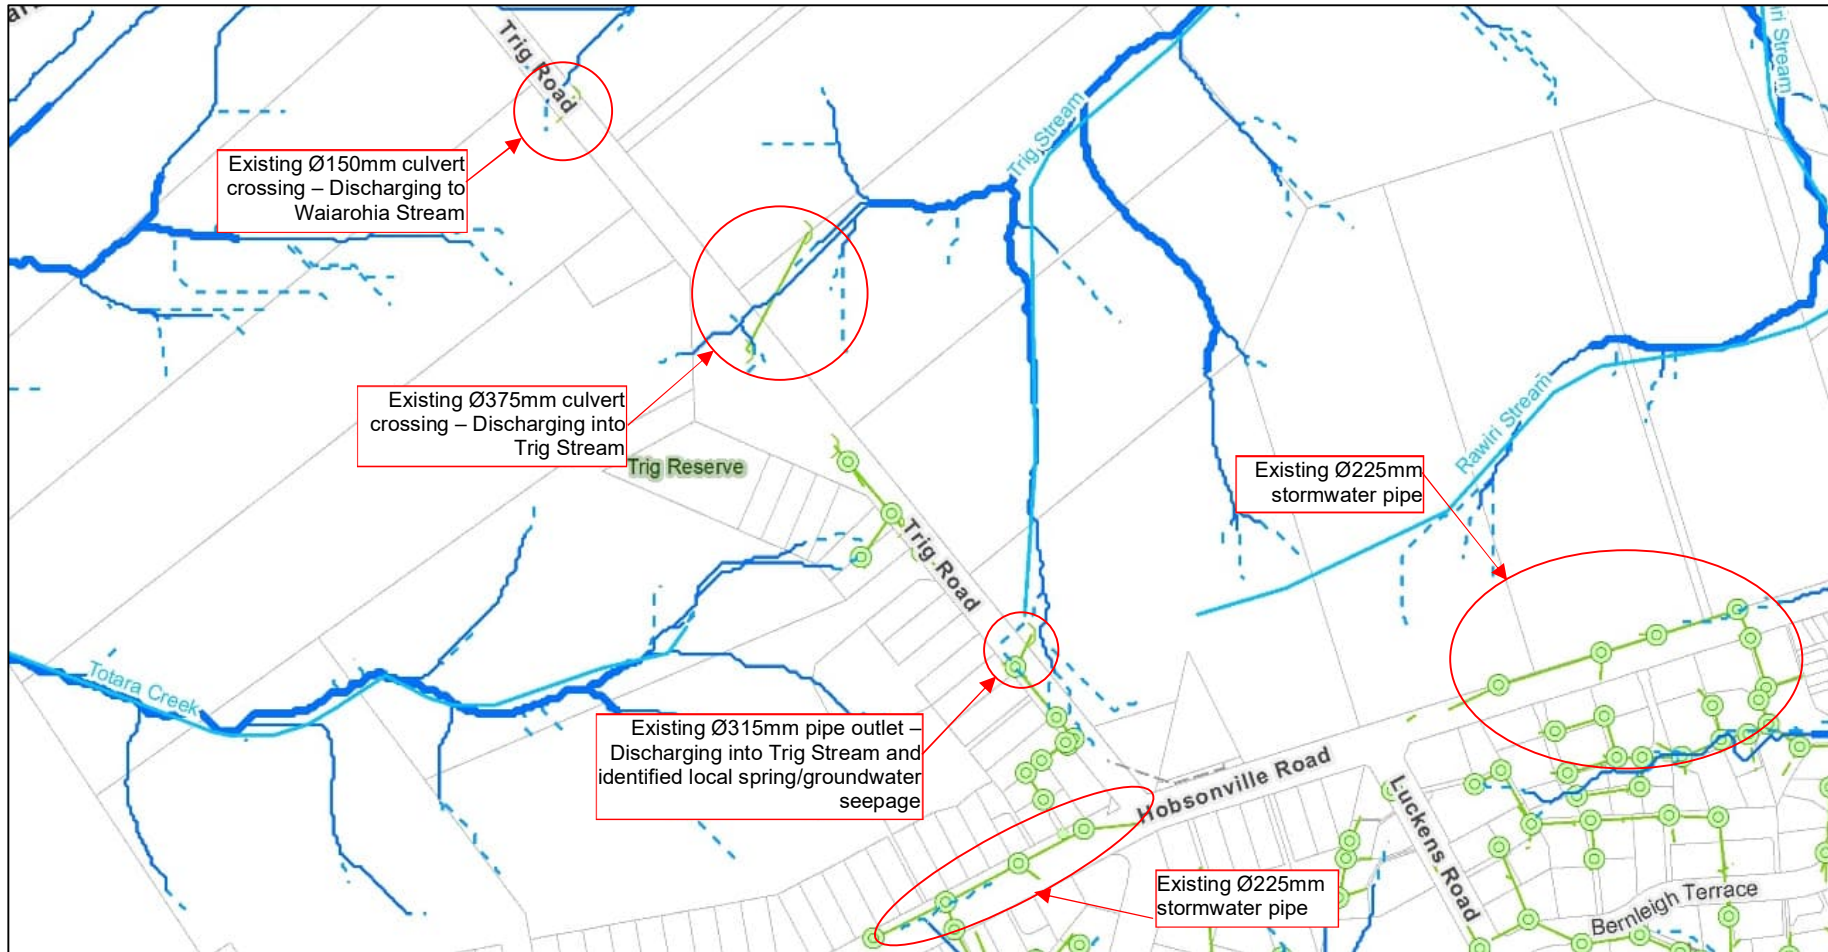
Existing Trig Road Corridor/Hobsonville Road Stormwater Infrastructure (AC – Geomaps 2022)
